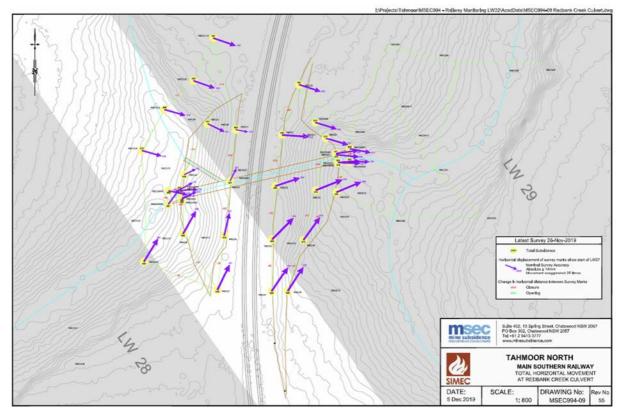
Observed total horizontal movement at Redbank Creek Culvert and embankment during the mining of Longwalls 27 to32
